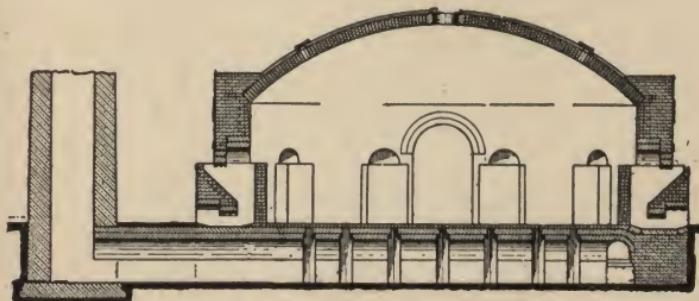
,825.—Round down draft kiln for burning high class ware such as facing brick, roofing tile, fire brick, and sewer pipe.
